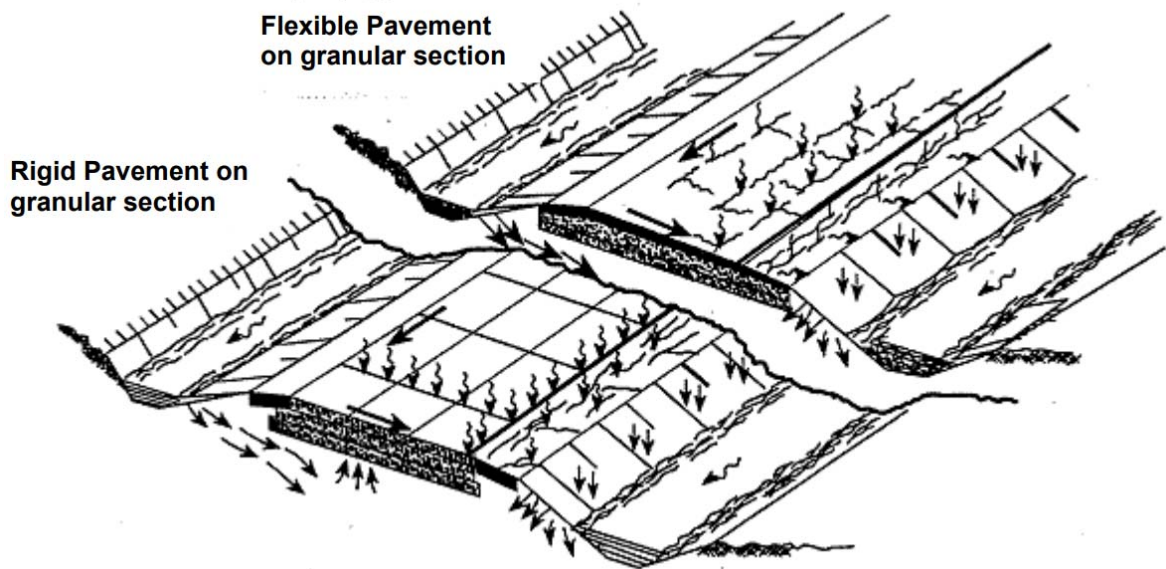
Water Infiltration into Flexible and Rigid Pavement Sections (Ministry of Transportation of Ontario, 2013)
